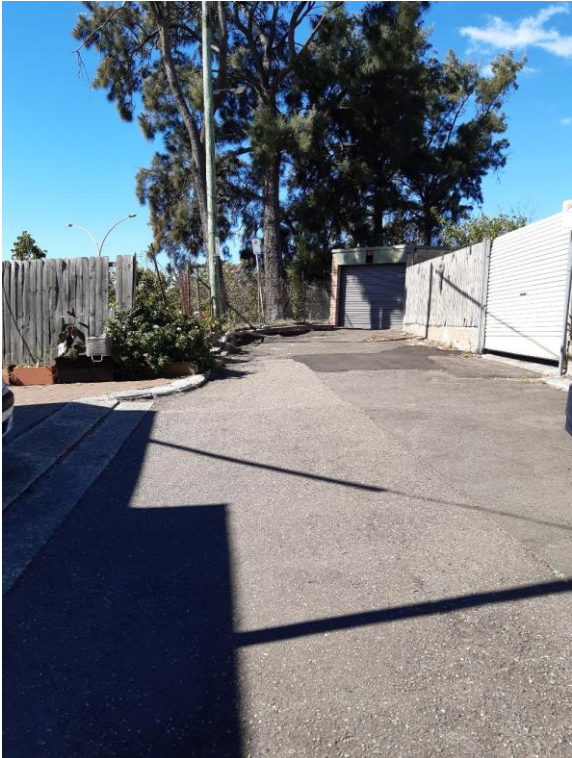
Proposed Location of RMS noise wall at North Eastern end of St Thomas Rest Park adjacent to Warringah Freeway
